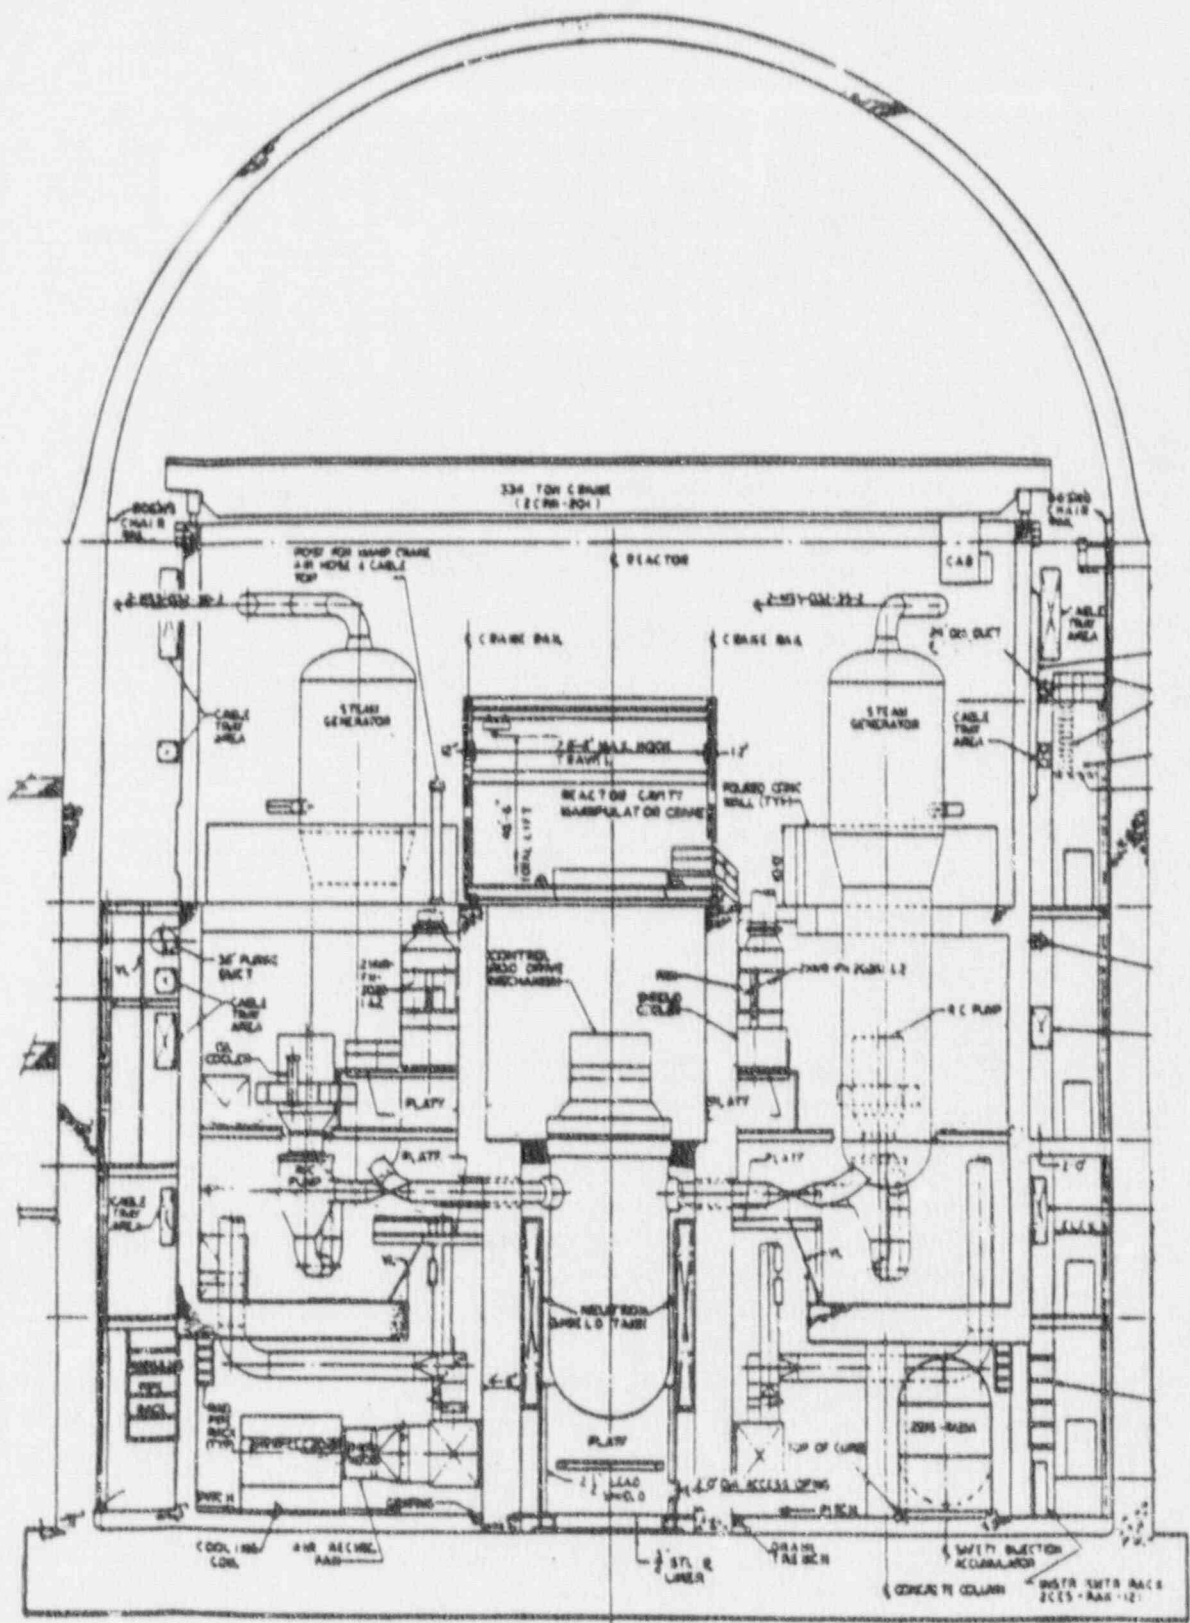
General Arrangement of the Beaver Valley 1 Containment Building
